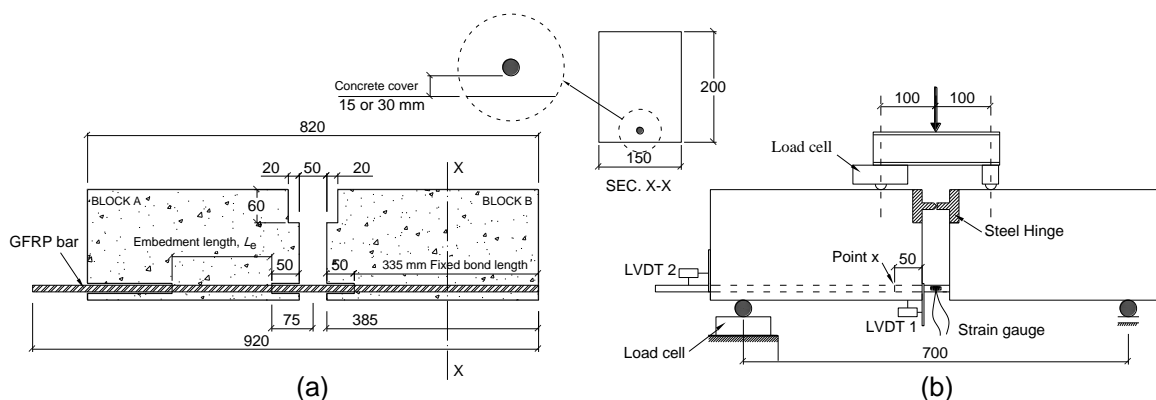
(a) Details of the specimen, and (b) test setup (dimensions in mm)
